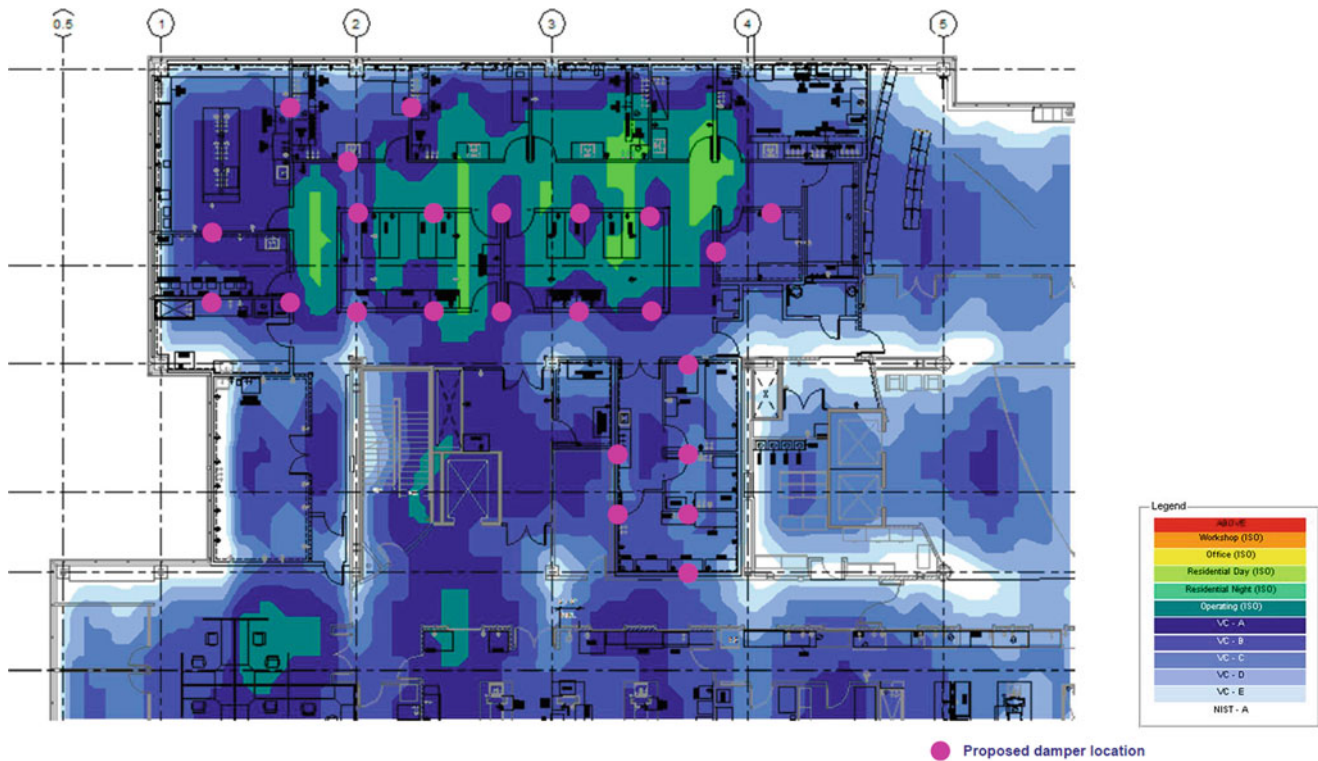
Predicted floor vibrations due to originally proposed viscous damper layout
